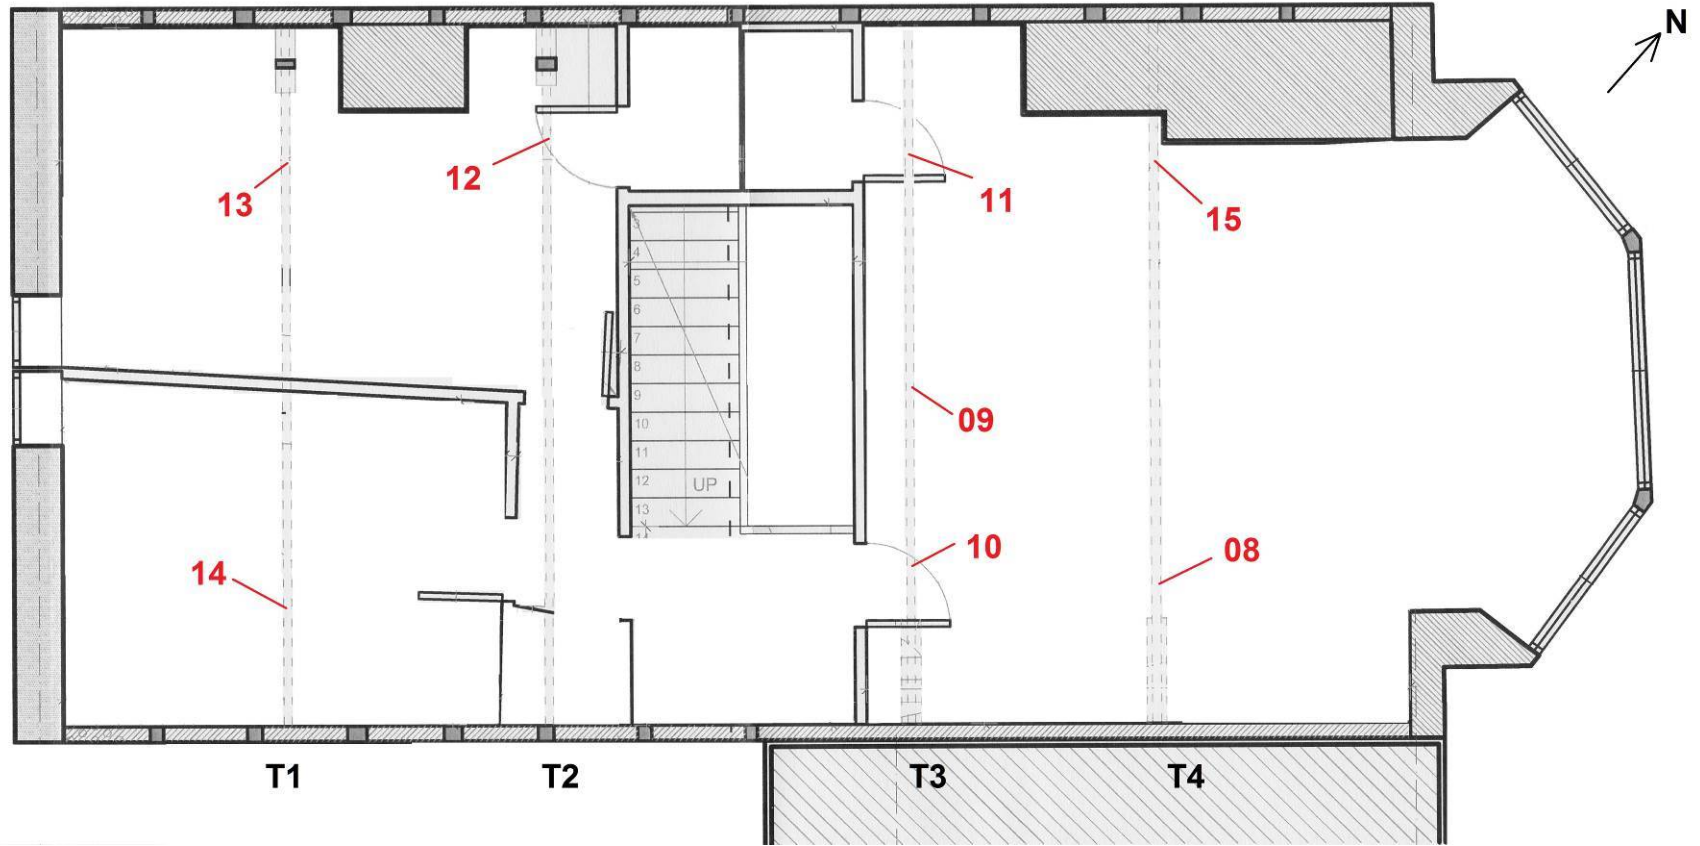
Attic floor plan showing the positions of the roof trusses and approximate positions of timbers sampled for dendrochronology (after Grigorov 2018)
